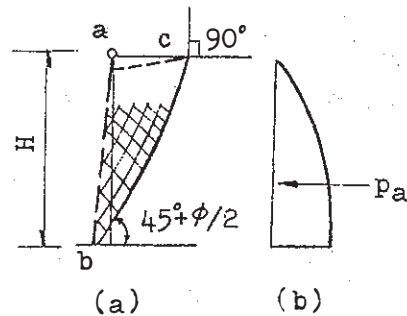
When a wall rotates around the top (a) failure plane (b) earth pressure distribution
